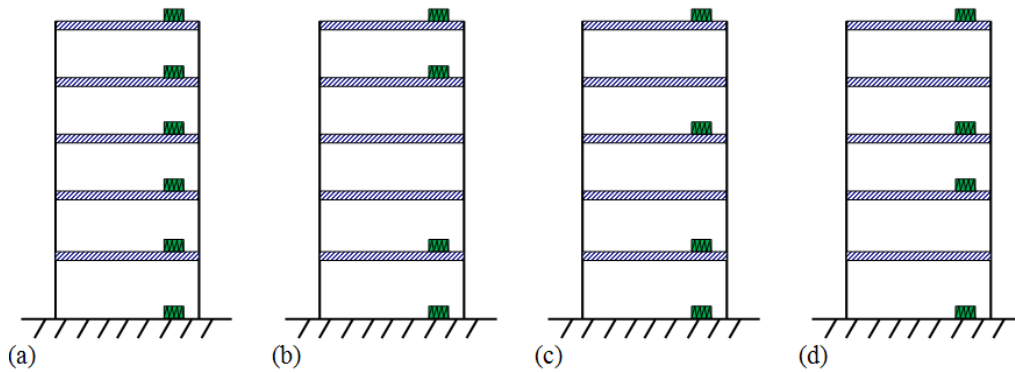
Different tested configurations for damage localization for the structure with 5 floors
